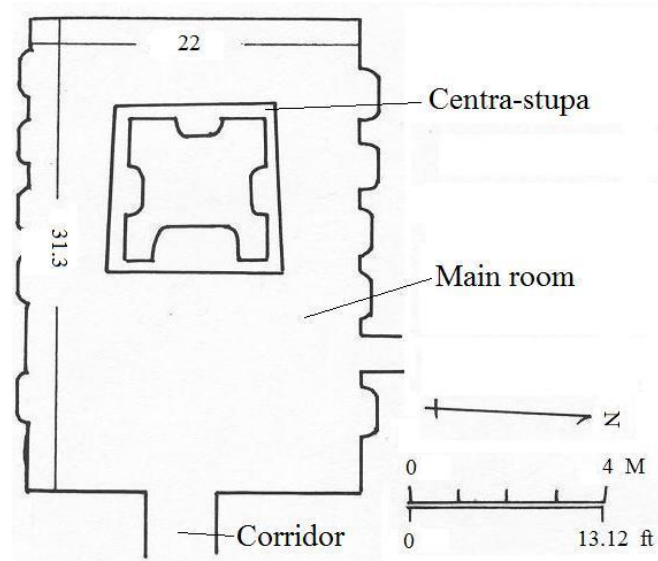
A floor plan of Cave 254, the Northern Wei. Source: Shih 1996:163.
